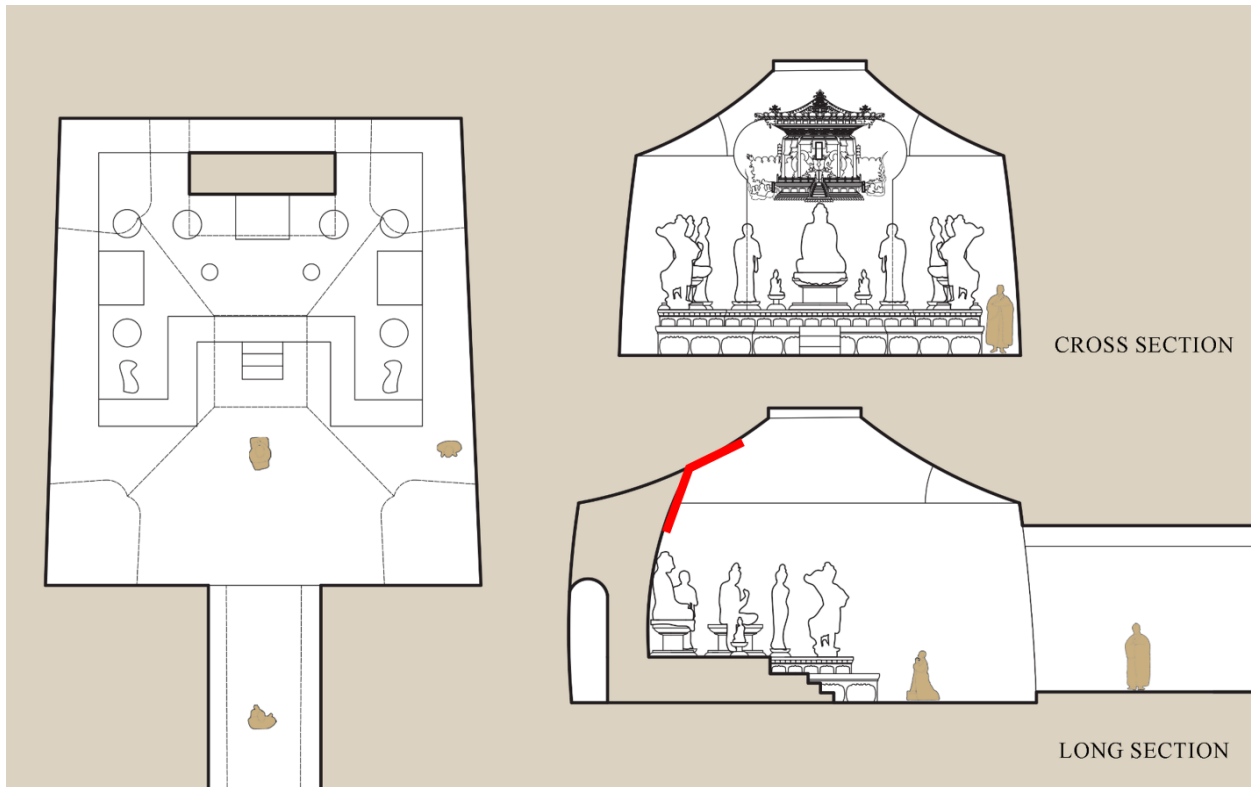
Plan and sectional drawings of Cave 454 showing author's reconstructual design of the backscreened design possibility. Red lines highlight the location of the Many Treasures Pagoda painting on the west ceiling slope and the backscreen. Drawing by author.
